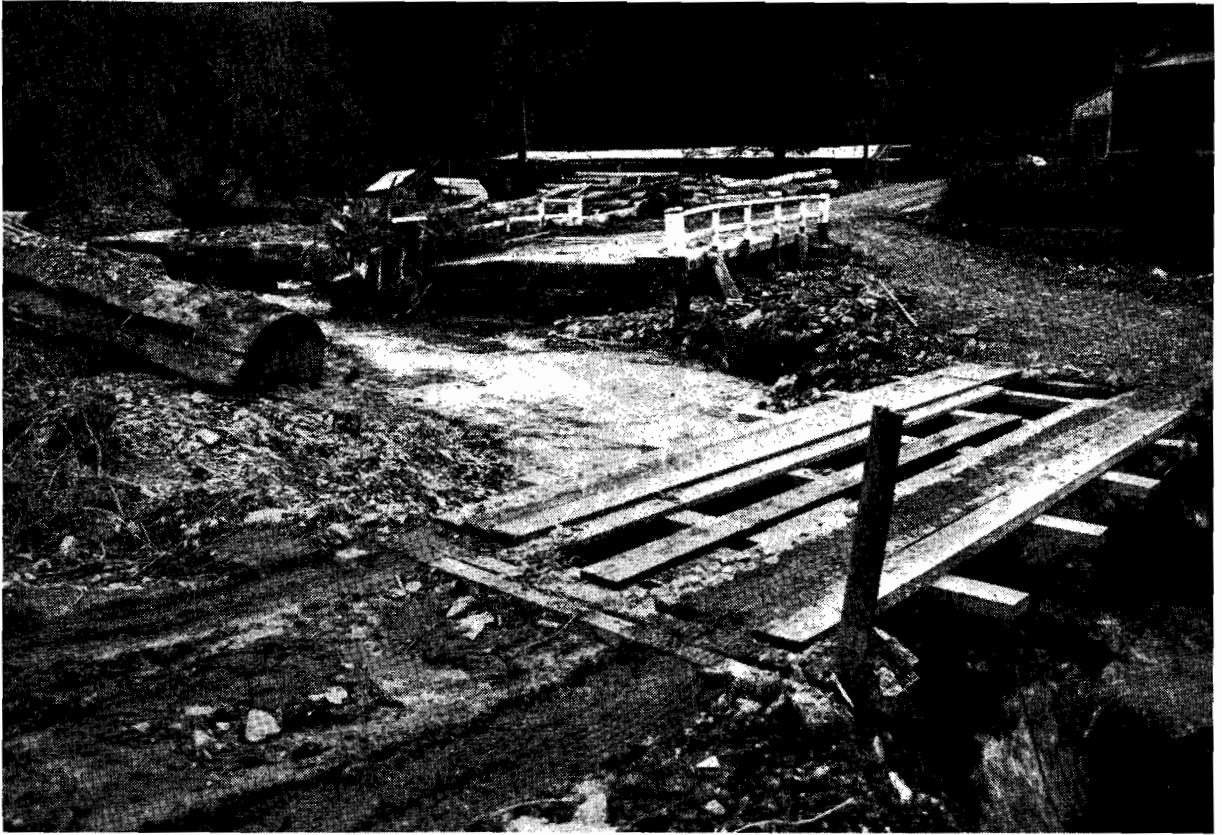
Walhalla Road. Obstruction of bridge over Stringers Creek by debris with extensive scour behind abutment.
